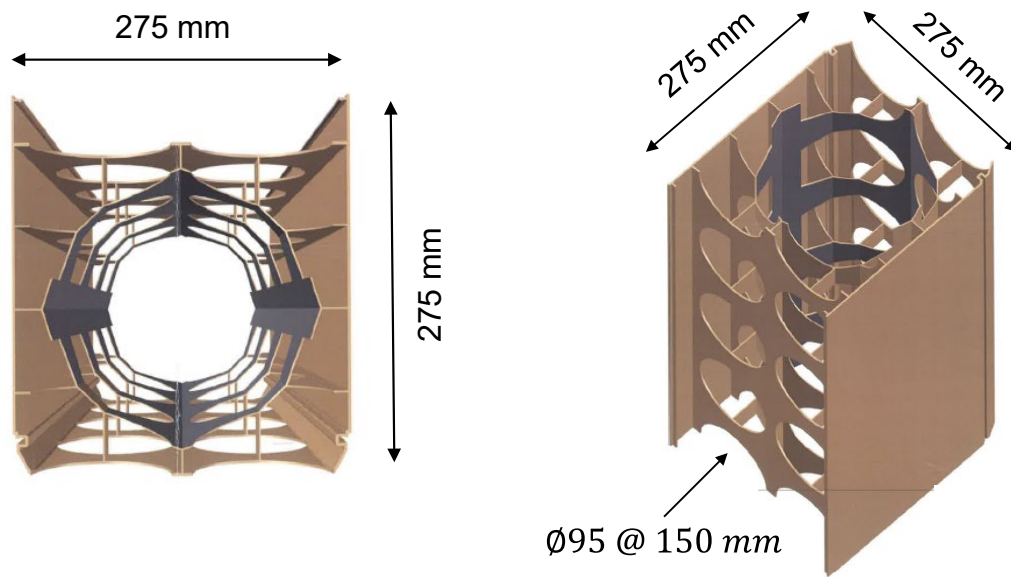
Three-dimensional views of 275 mm Dintel structural walling panels
